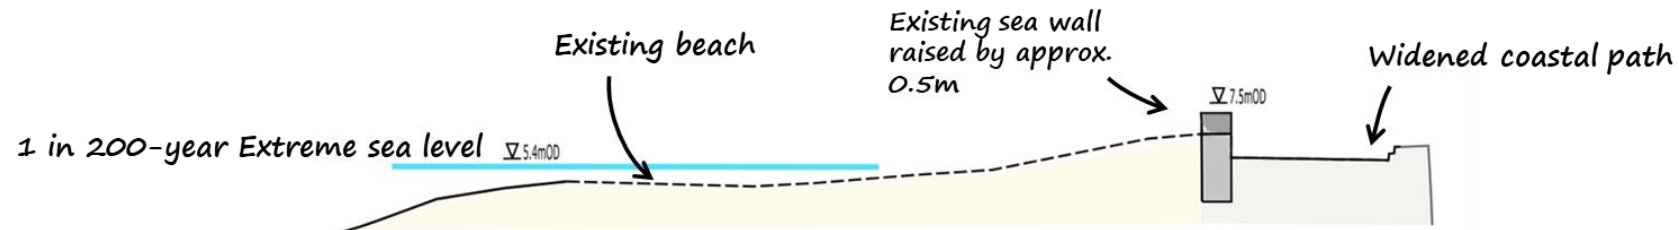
Cross section of raised sea wall at Kinmel Bay Beach West
